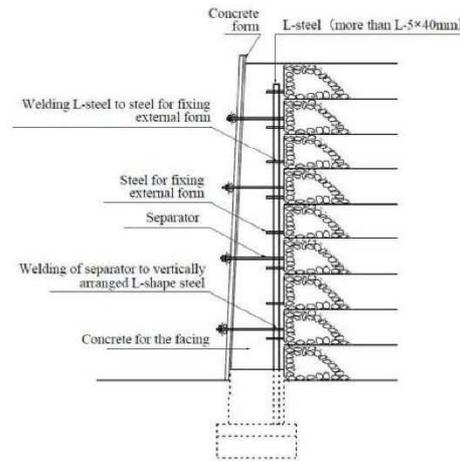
Example of the method to fix concrete form for the facing construction using welded steel fabric
